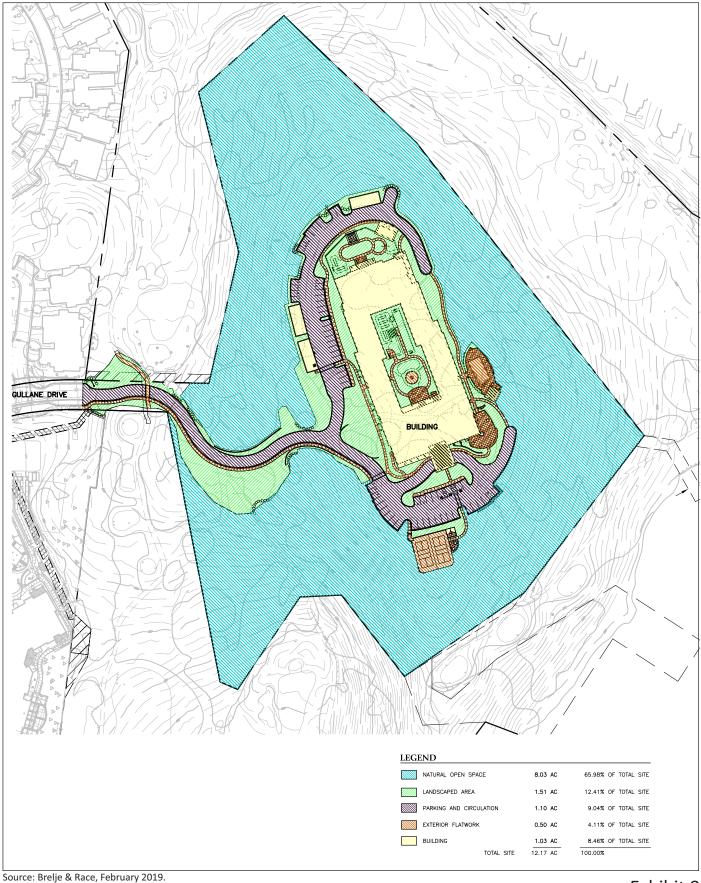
2017 Emerald Isle Assisted Living Facility Project Site Coverage Plan
